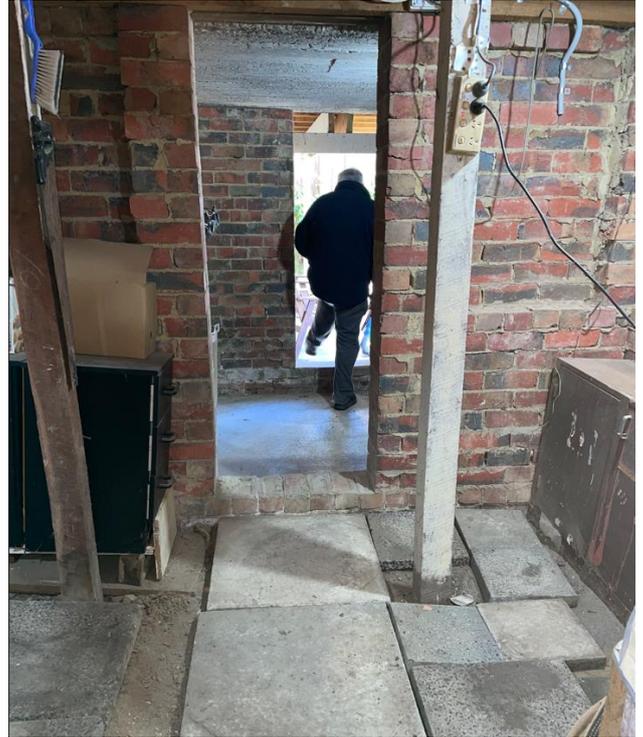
View from east side of sub-floor (under the sunroom area) facing west, in alignment with opening to bike storage under solid part of porch structure. A deck area extends further east, as visible in photos of the rear of the house.
